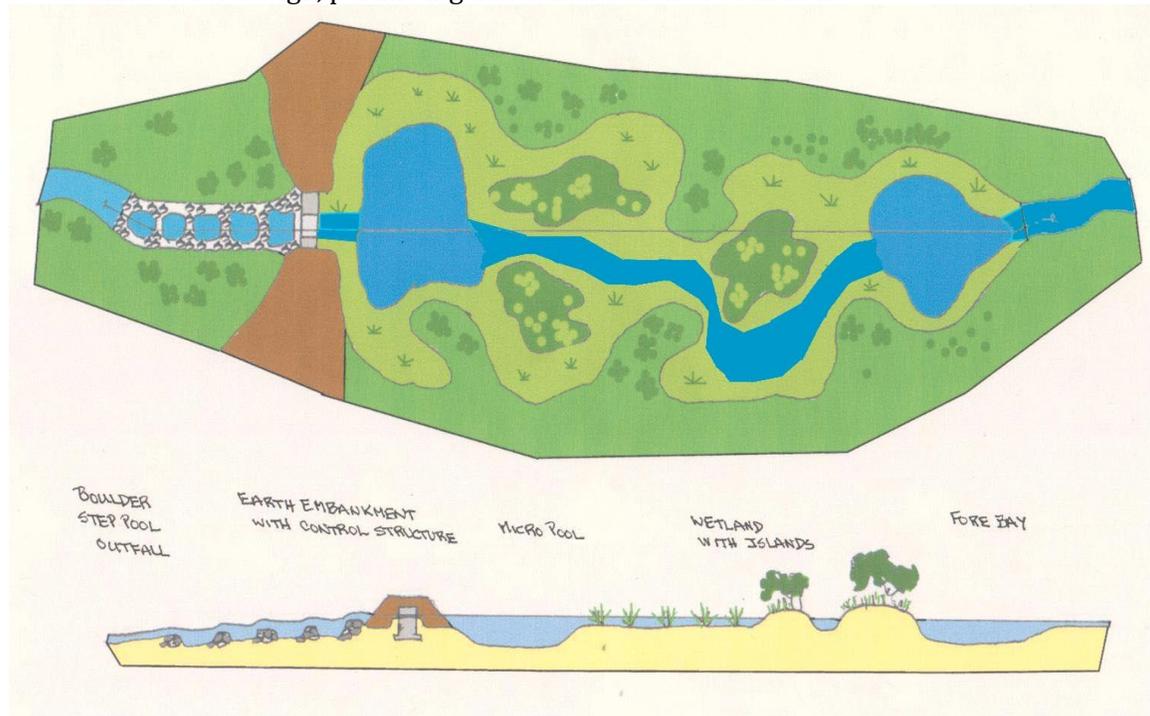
Typical Stormwater Wetland in plan view (upper) and profile (lower)
